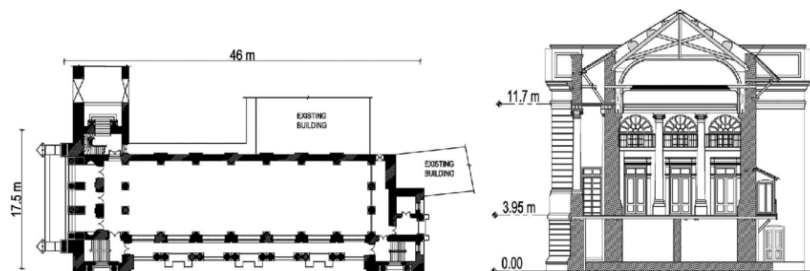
Gaddhi Baithak Palace plan (left) and section (right)
